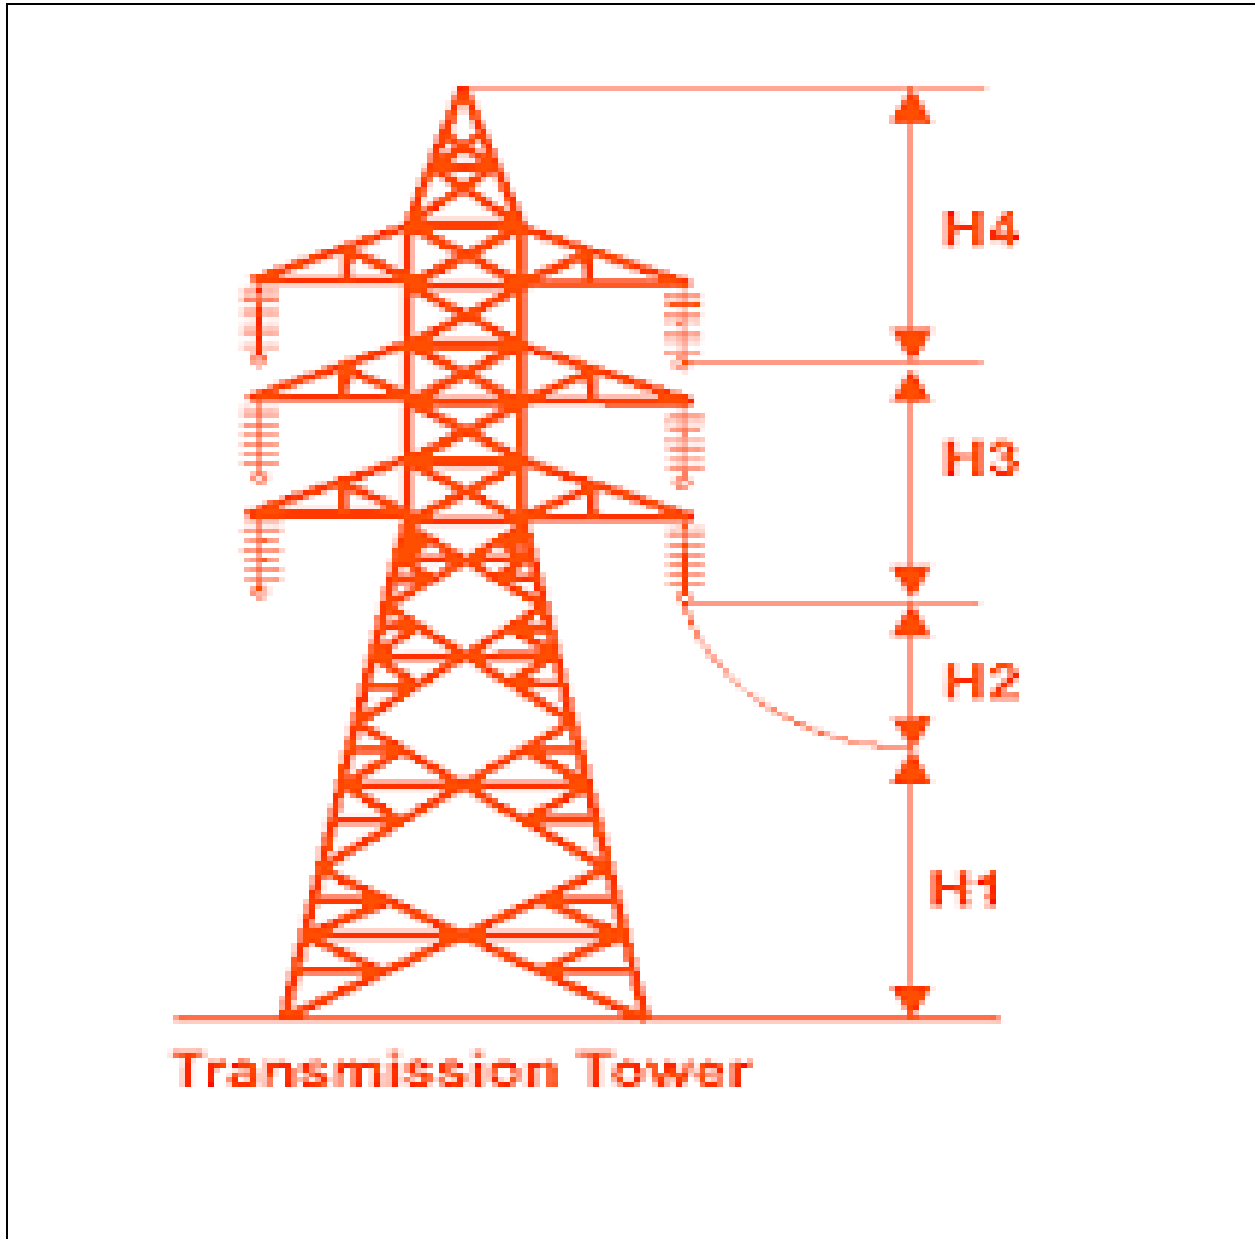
A Typical Tower arrangement for Double Circuit connection
